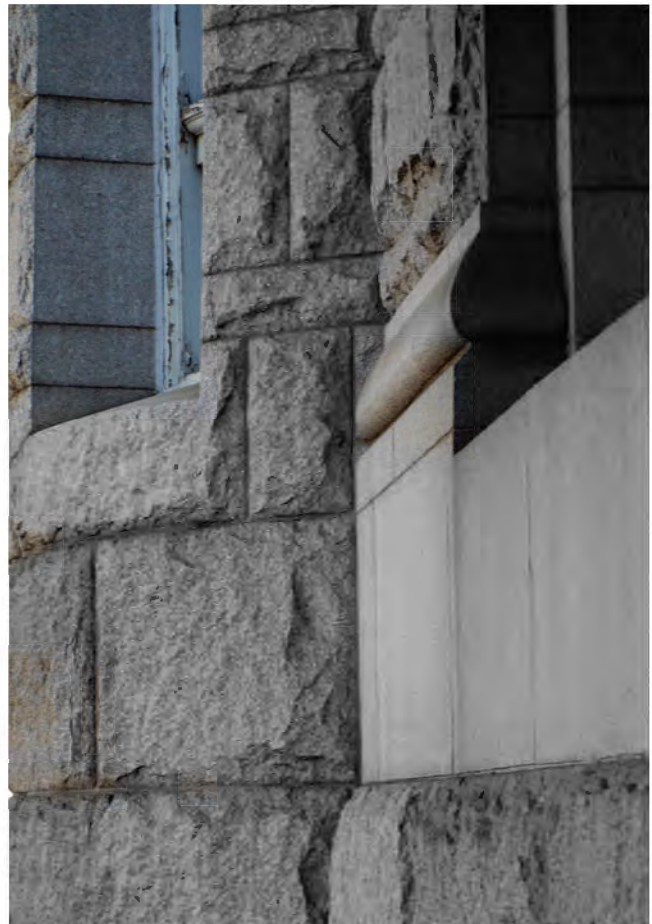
Detail of NW Pavilion 1st Floor Sill Course, 2012. Photo Courtesy OLBN Inc.
